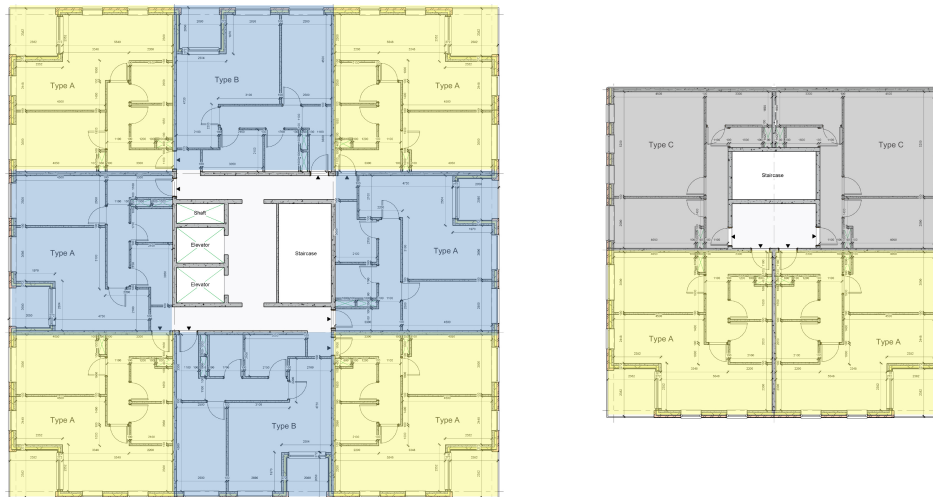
Internal layout of the tower block (left) and of the walk-up apartment building (right). Type A apartments are coloured in yellow, Type B apartments in blue and Type C apartments in grey.
